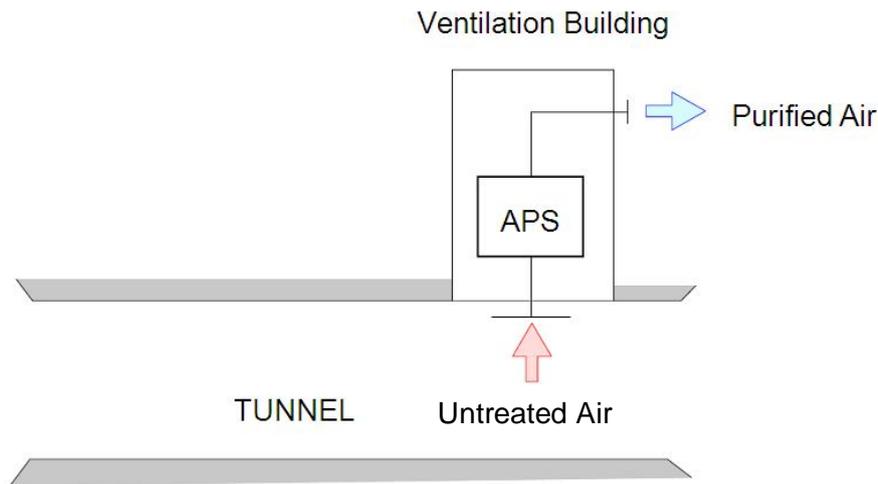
APS Configuration for Ventilation Building Installation
